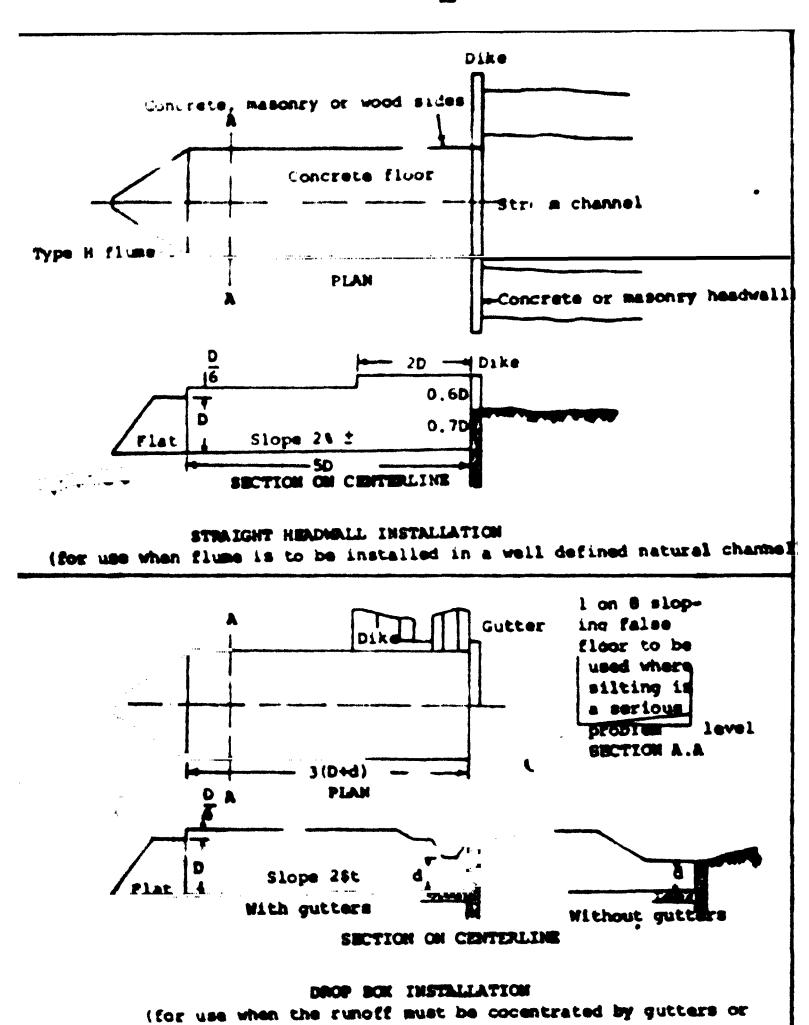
PLANS FOR STRAIGHT HEADHALL AND DROP BOX INSTALLATIONS OF
